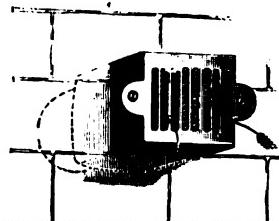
Single mica flap-valve for horizontal air inlet.
